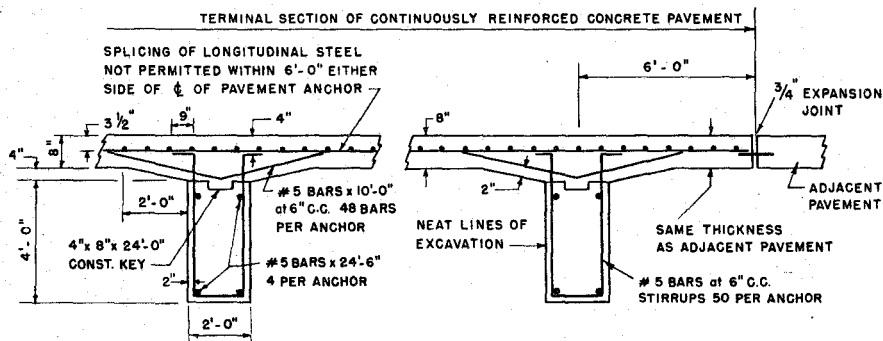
SPECIAL PAVING DETAILS AT PILING ANCHORAGE
